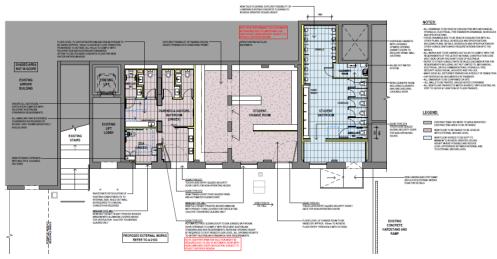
Proposed Internal Works Floor Plan. (Source: RFA Architects)
